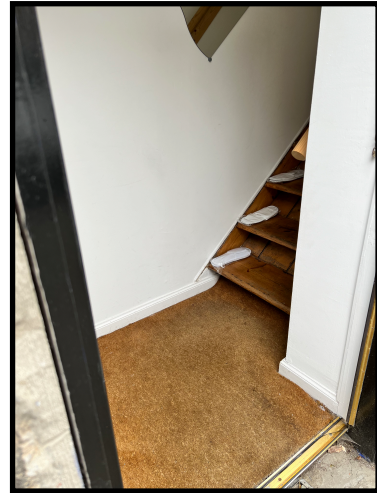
Entrance with stairs up to the apartment, 20 Randolph Lane
